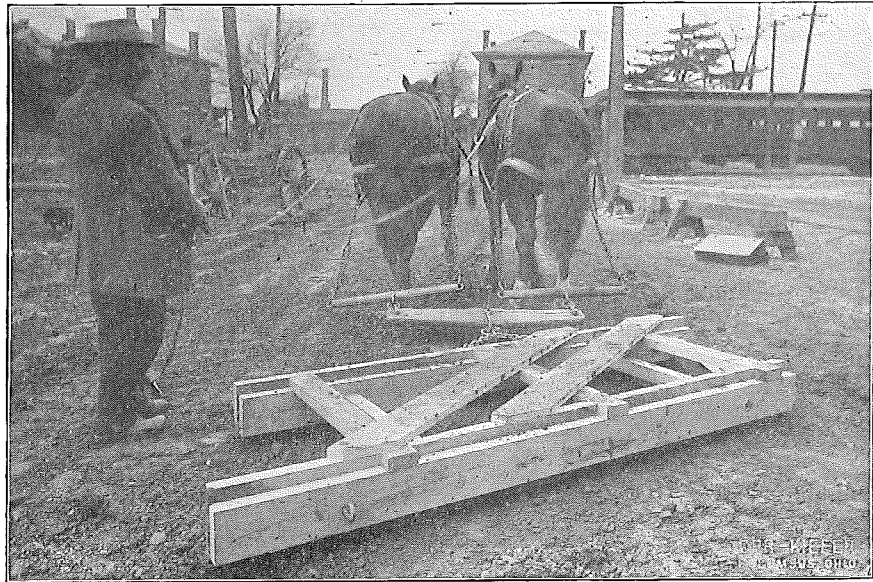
Rear view of plank drag in operation, made after the design shown in Fig. 8.
